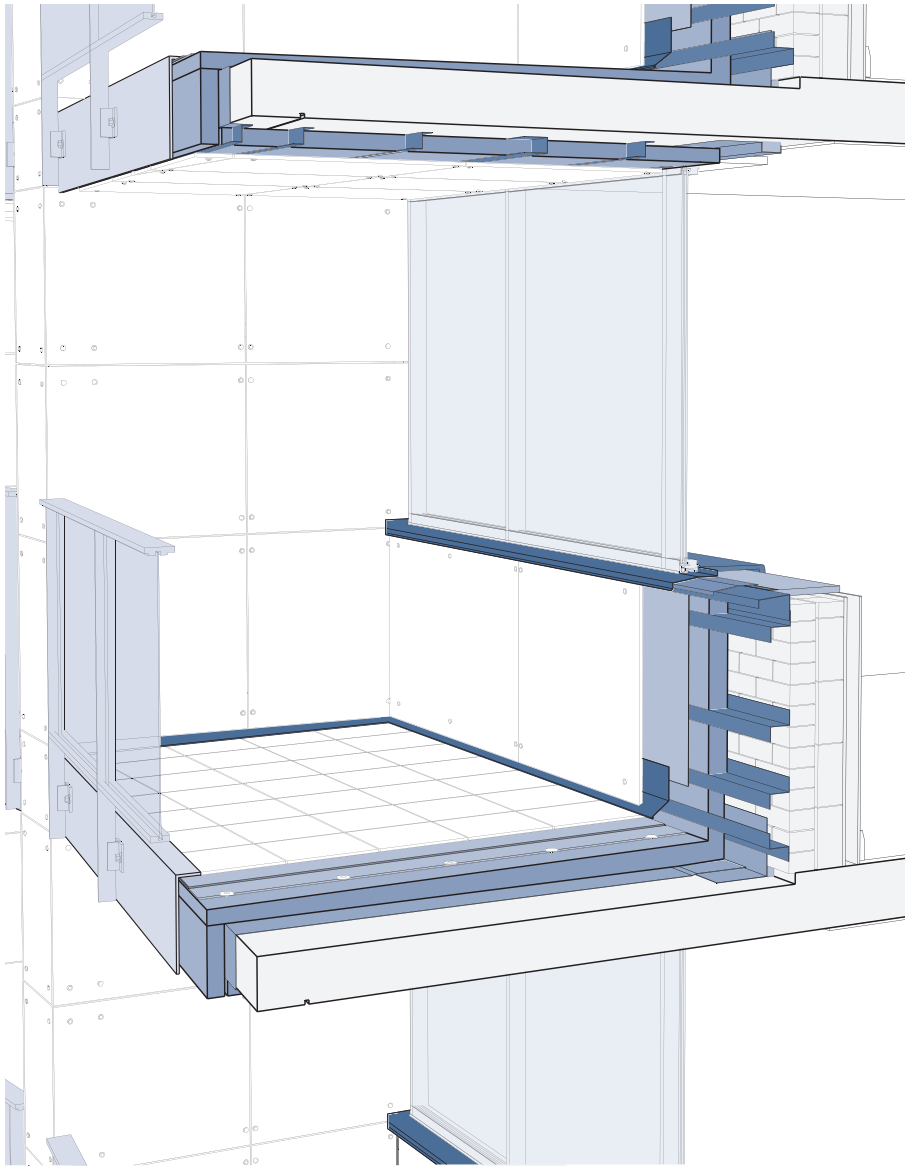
Installation of the tile and grout proceeds next, followed by caulking as specified to complete the floor assembly. A gasket is applied over the vertical hat channels and then the cladding panels are installed over the wall and soffit areas. A new balcony guard is installed to complete the balcony overcladding assembly.
